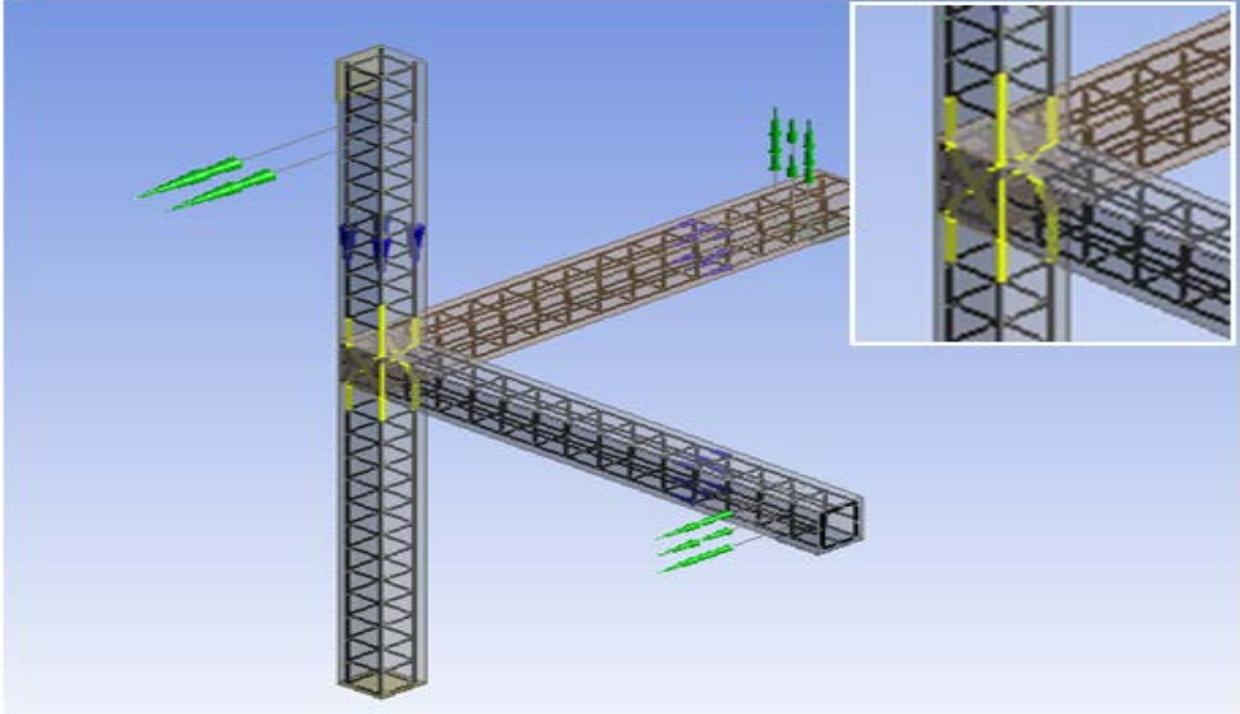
Modified reinforcement detailing of exterior joint with two beams (SS2)
